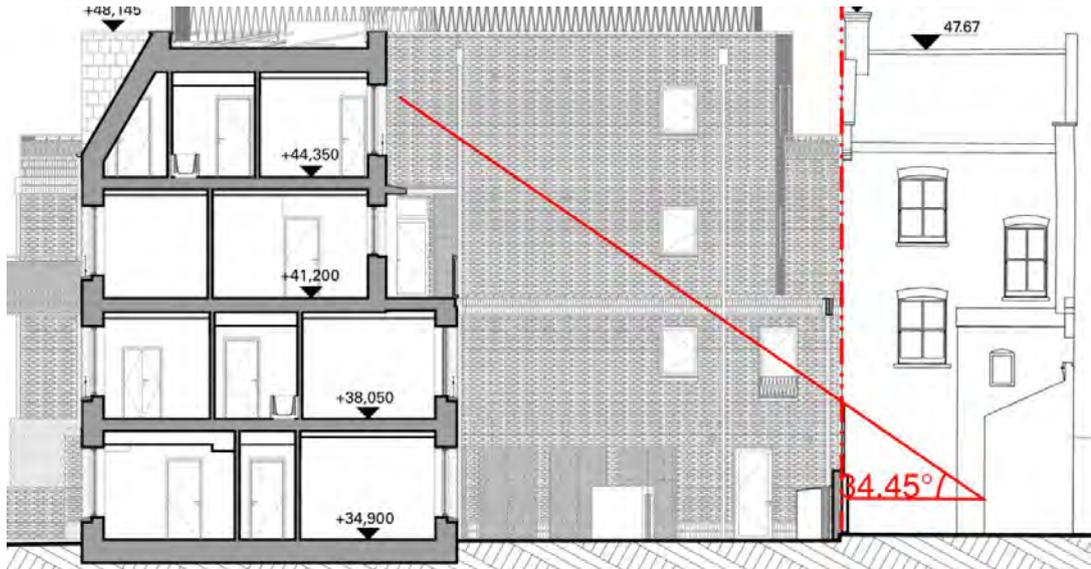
Showing the views from the windows on the new building to the ground floor windows at 51 Raglan Street, obscured by the boundary wall.
